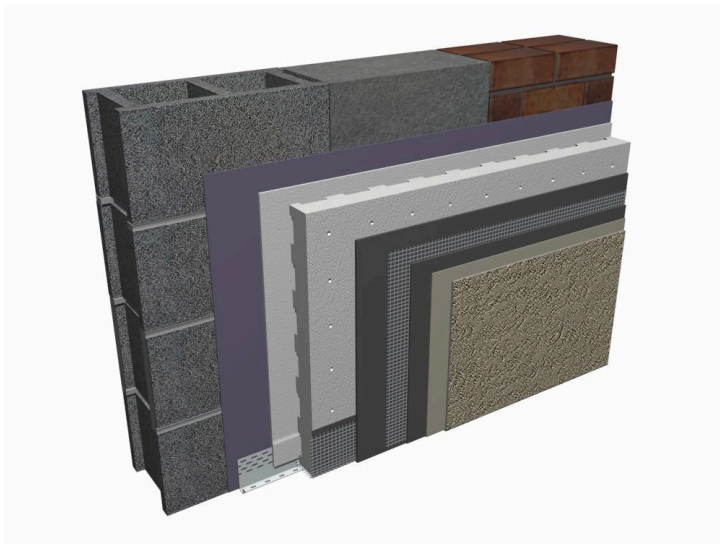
Puccs EIFS with Roller Bear and Polar Bear over masonry, concrete, and brick
